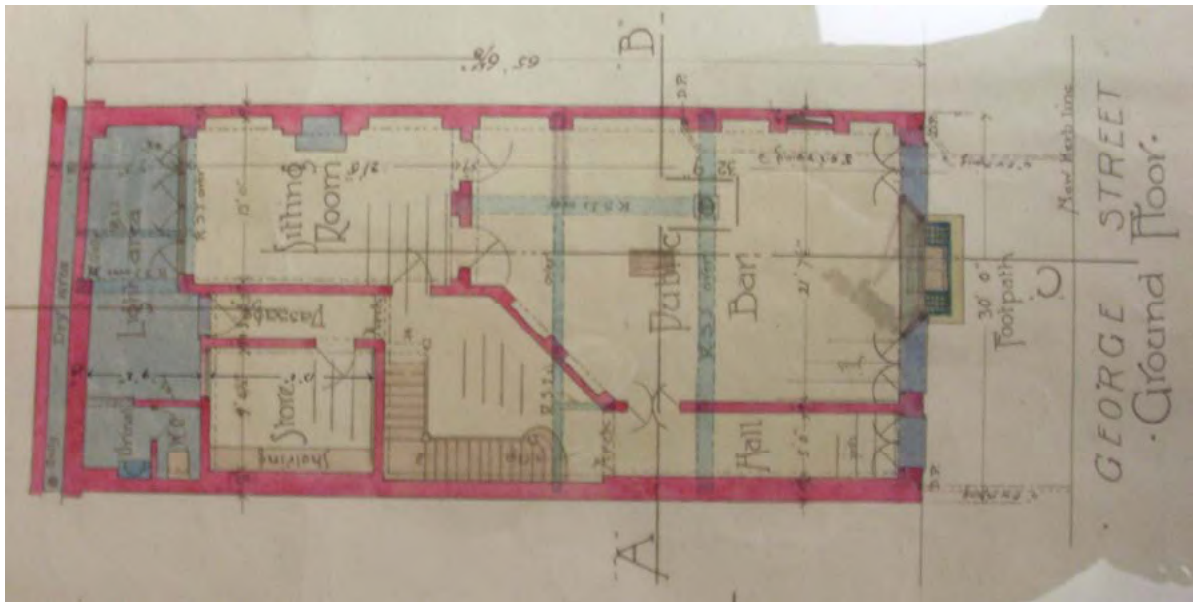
Plan of the ground floor bar showing public bar and rear sitting room. Upper floor accommodation area is accessed via separate hall and stair on the southern side of the building.
